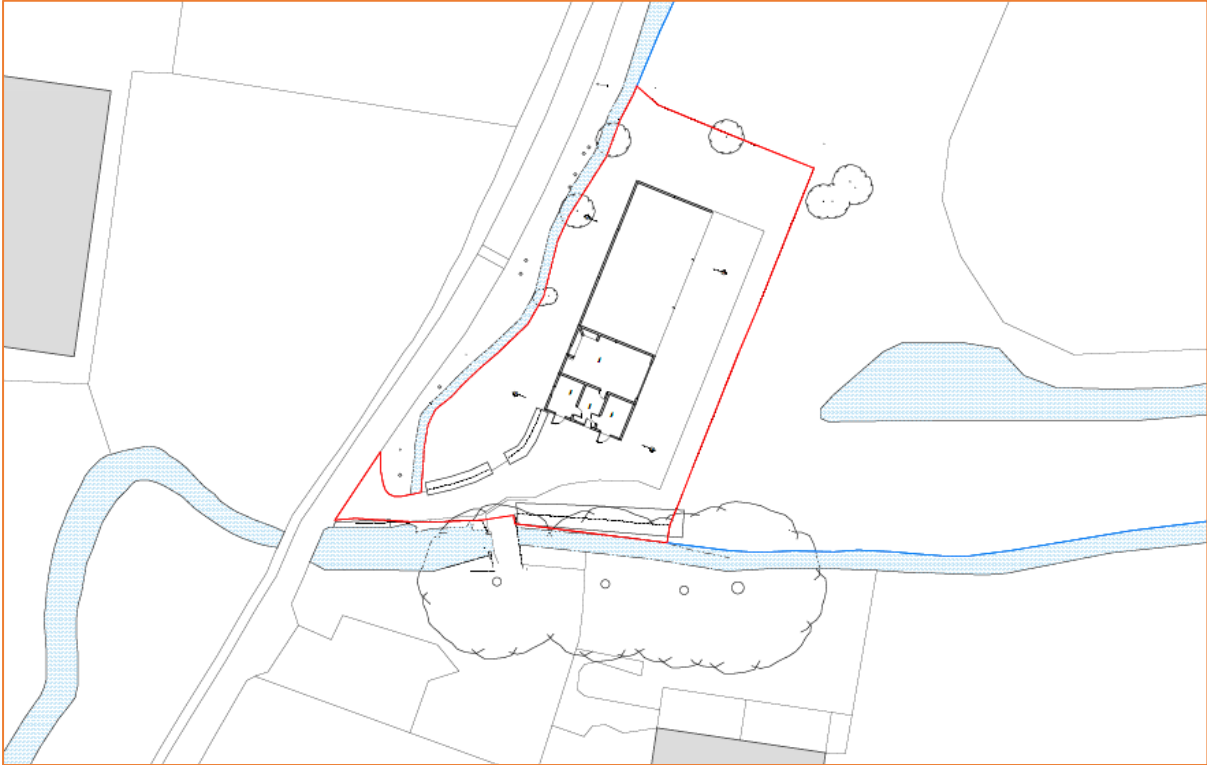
Existing Site Plan (Source: Studio Hudson Architects)
